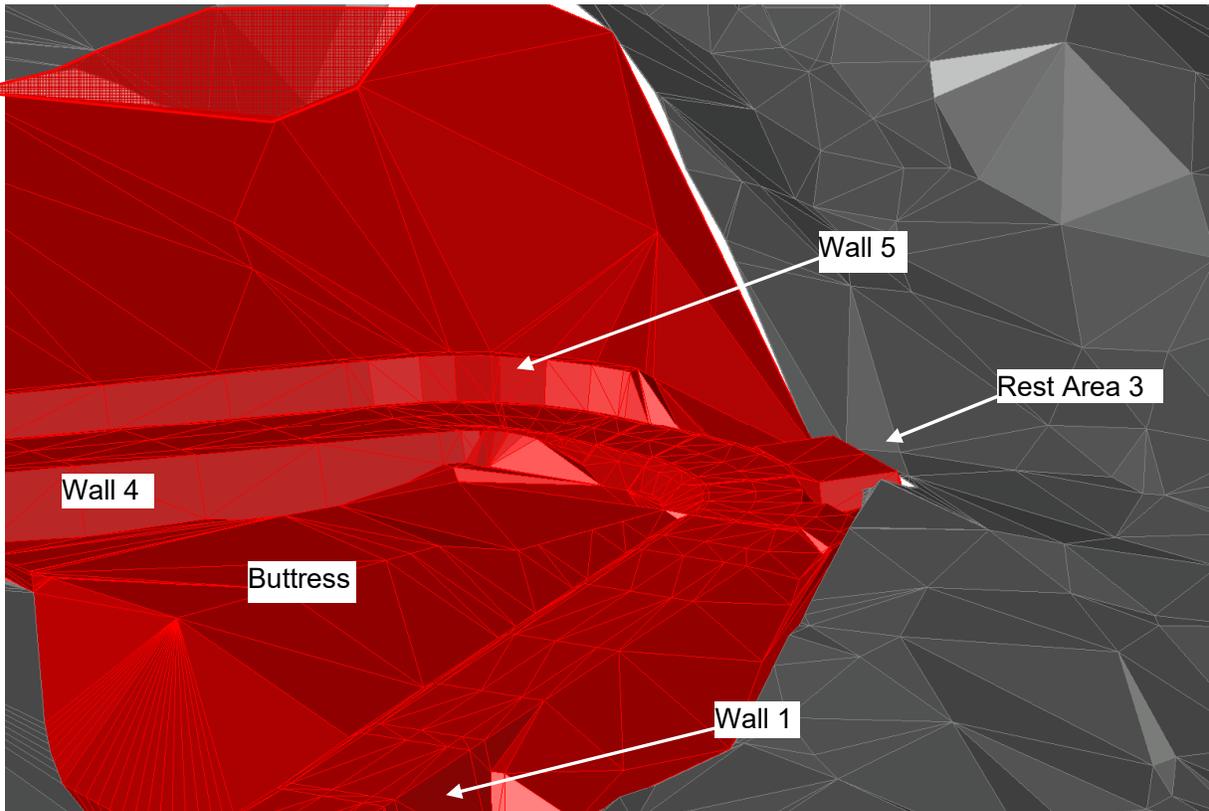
B 3D Rendering of proposed trail at lower switchback and buttness looking northeast (from low to high). Image provided by Parsons.
